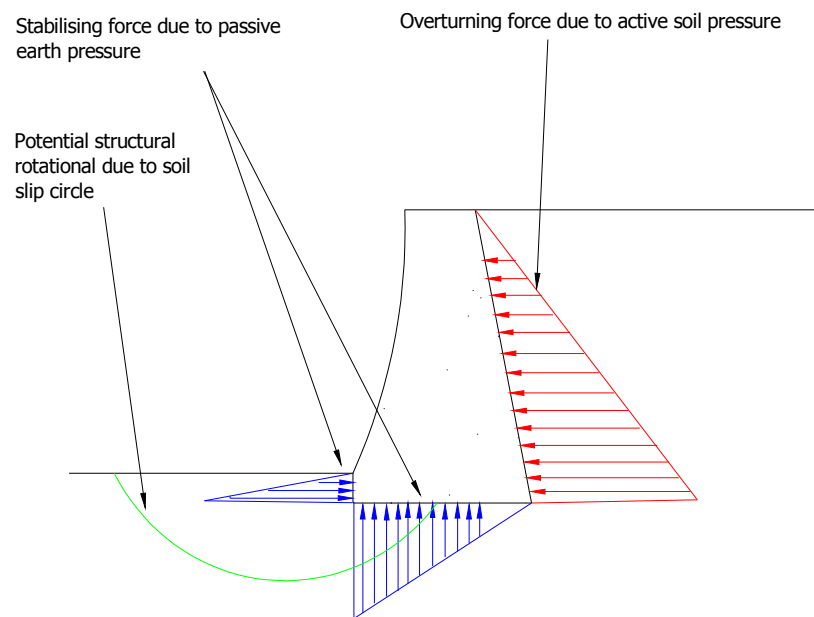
Section through a gravity quay wall showing overturning and stabilising forces
